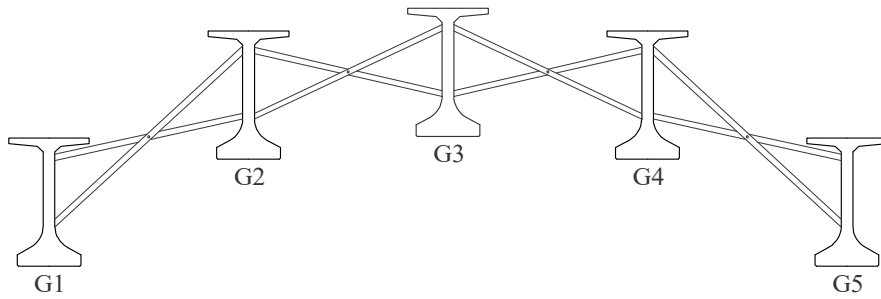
Bridge cross-section midspan deflection with interior timber X-bracing
